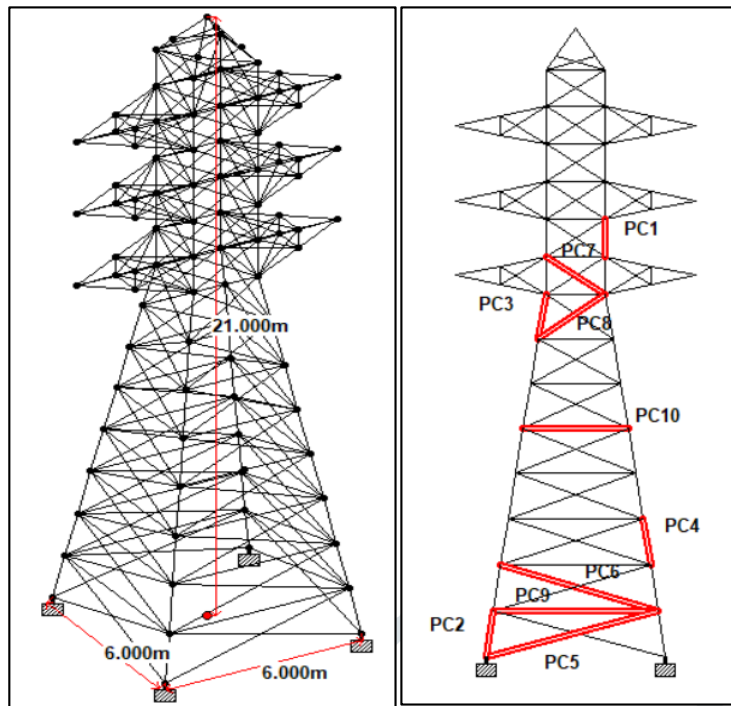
Modelling of self supporting tower Fig. 2. Details of members considered for removal
